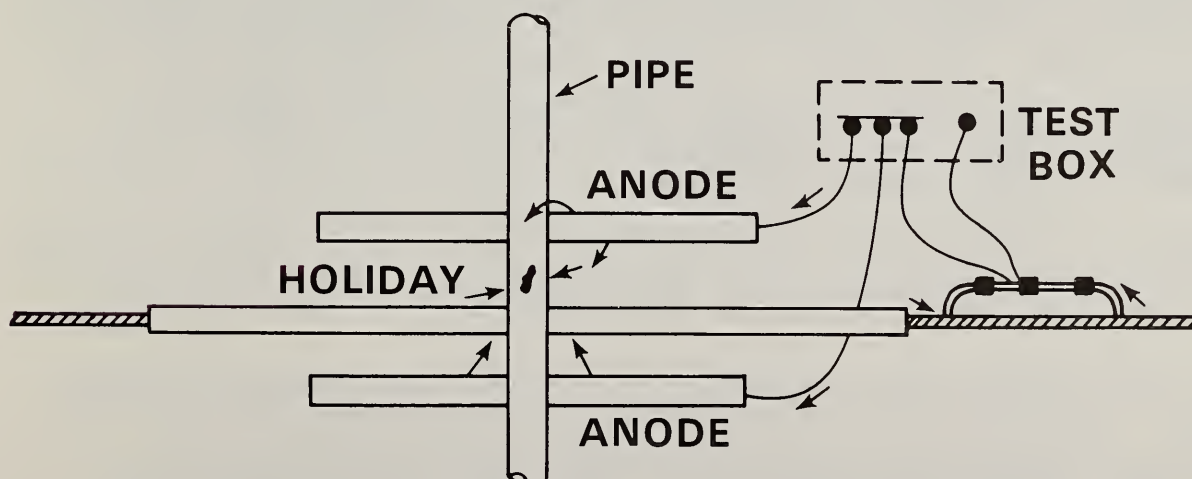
Underground cable and pipeline crossing with anodes installed for protection of cable.
